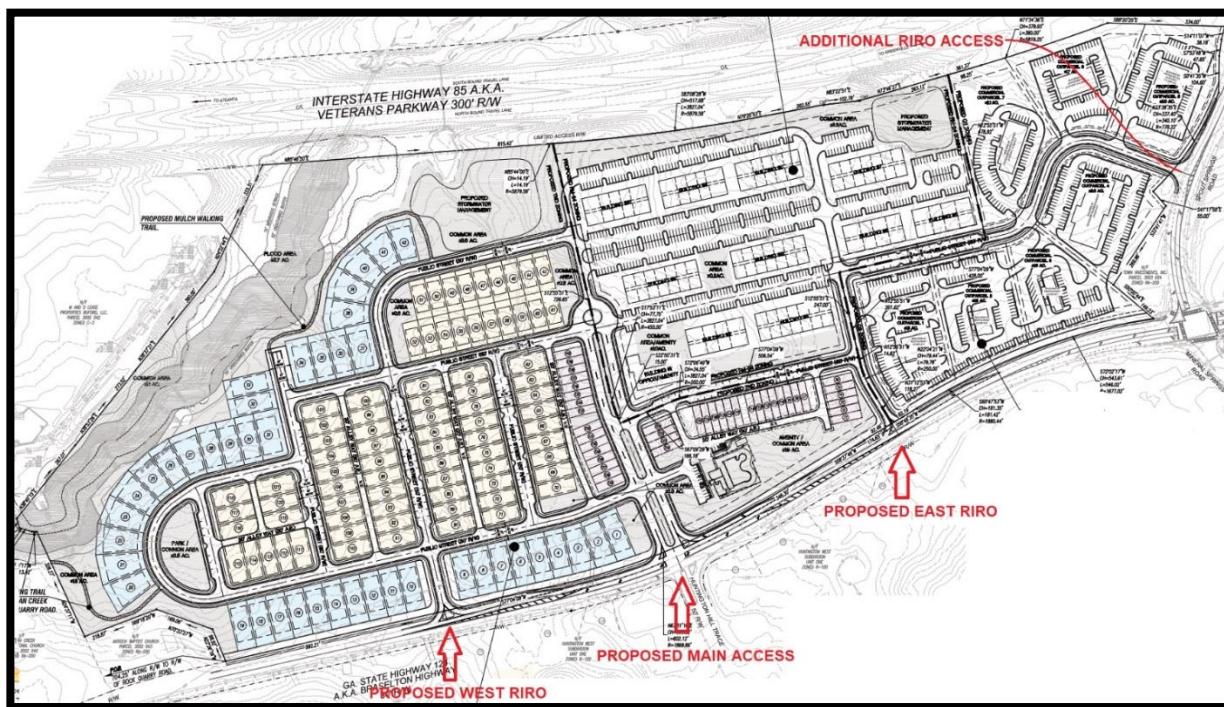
Proposed Development Site Plan Showing Three ICE Intersections
